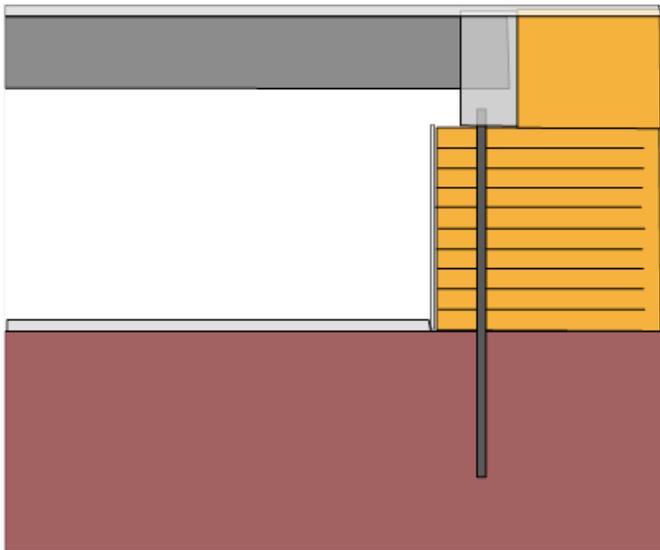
Typical pile supported bridge abutment with MSE abutment wall
